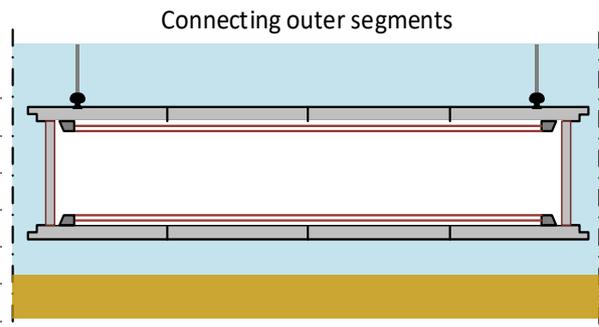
, PRESTRESSING VARIANT 1 LAYOUT
